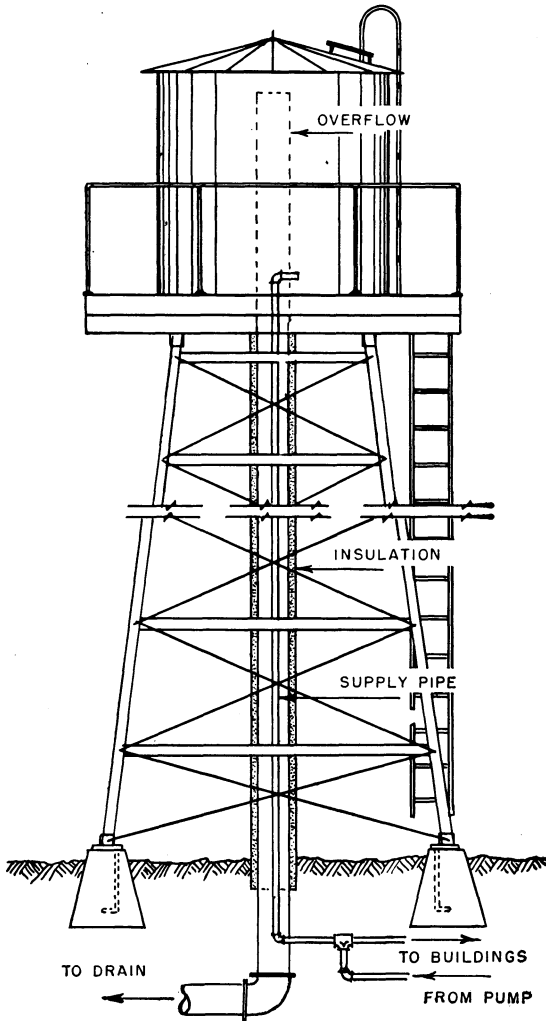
Elevated tank with overflow surrounding the supply pipe, insulation in place. Tank also may be insulated where long cold spells occur.
